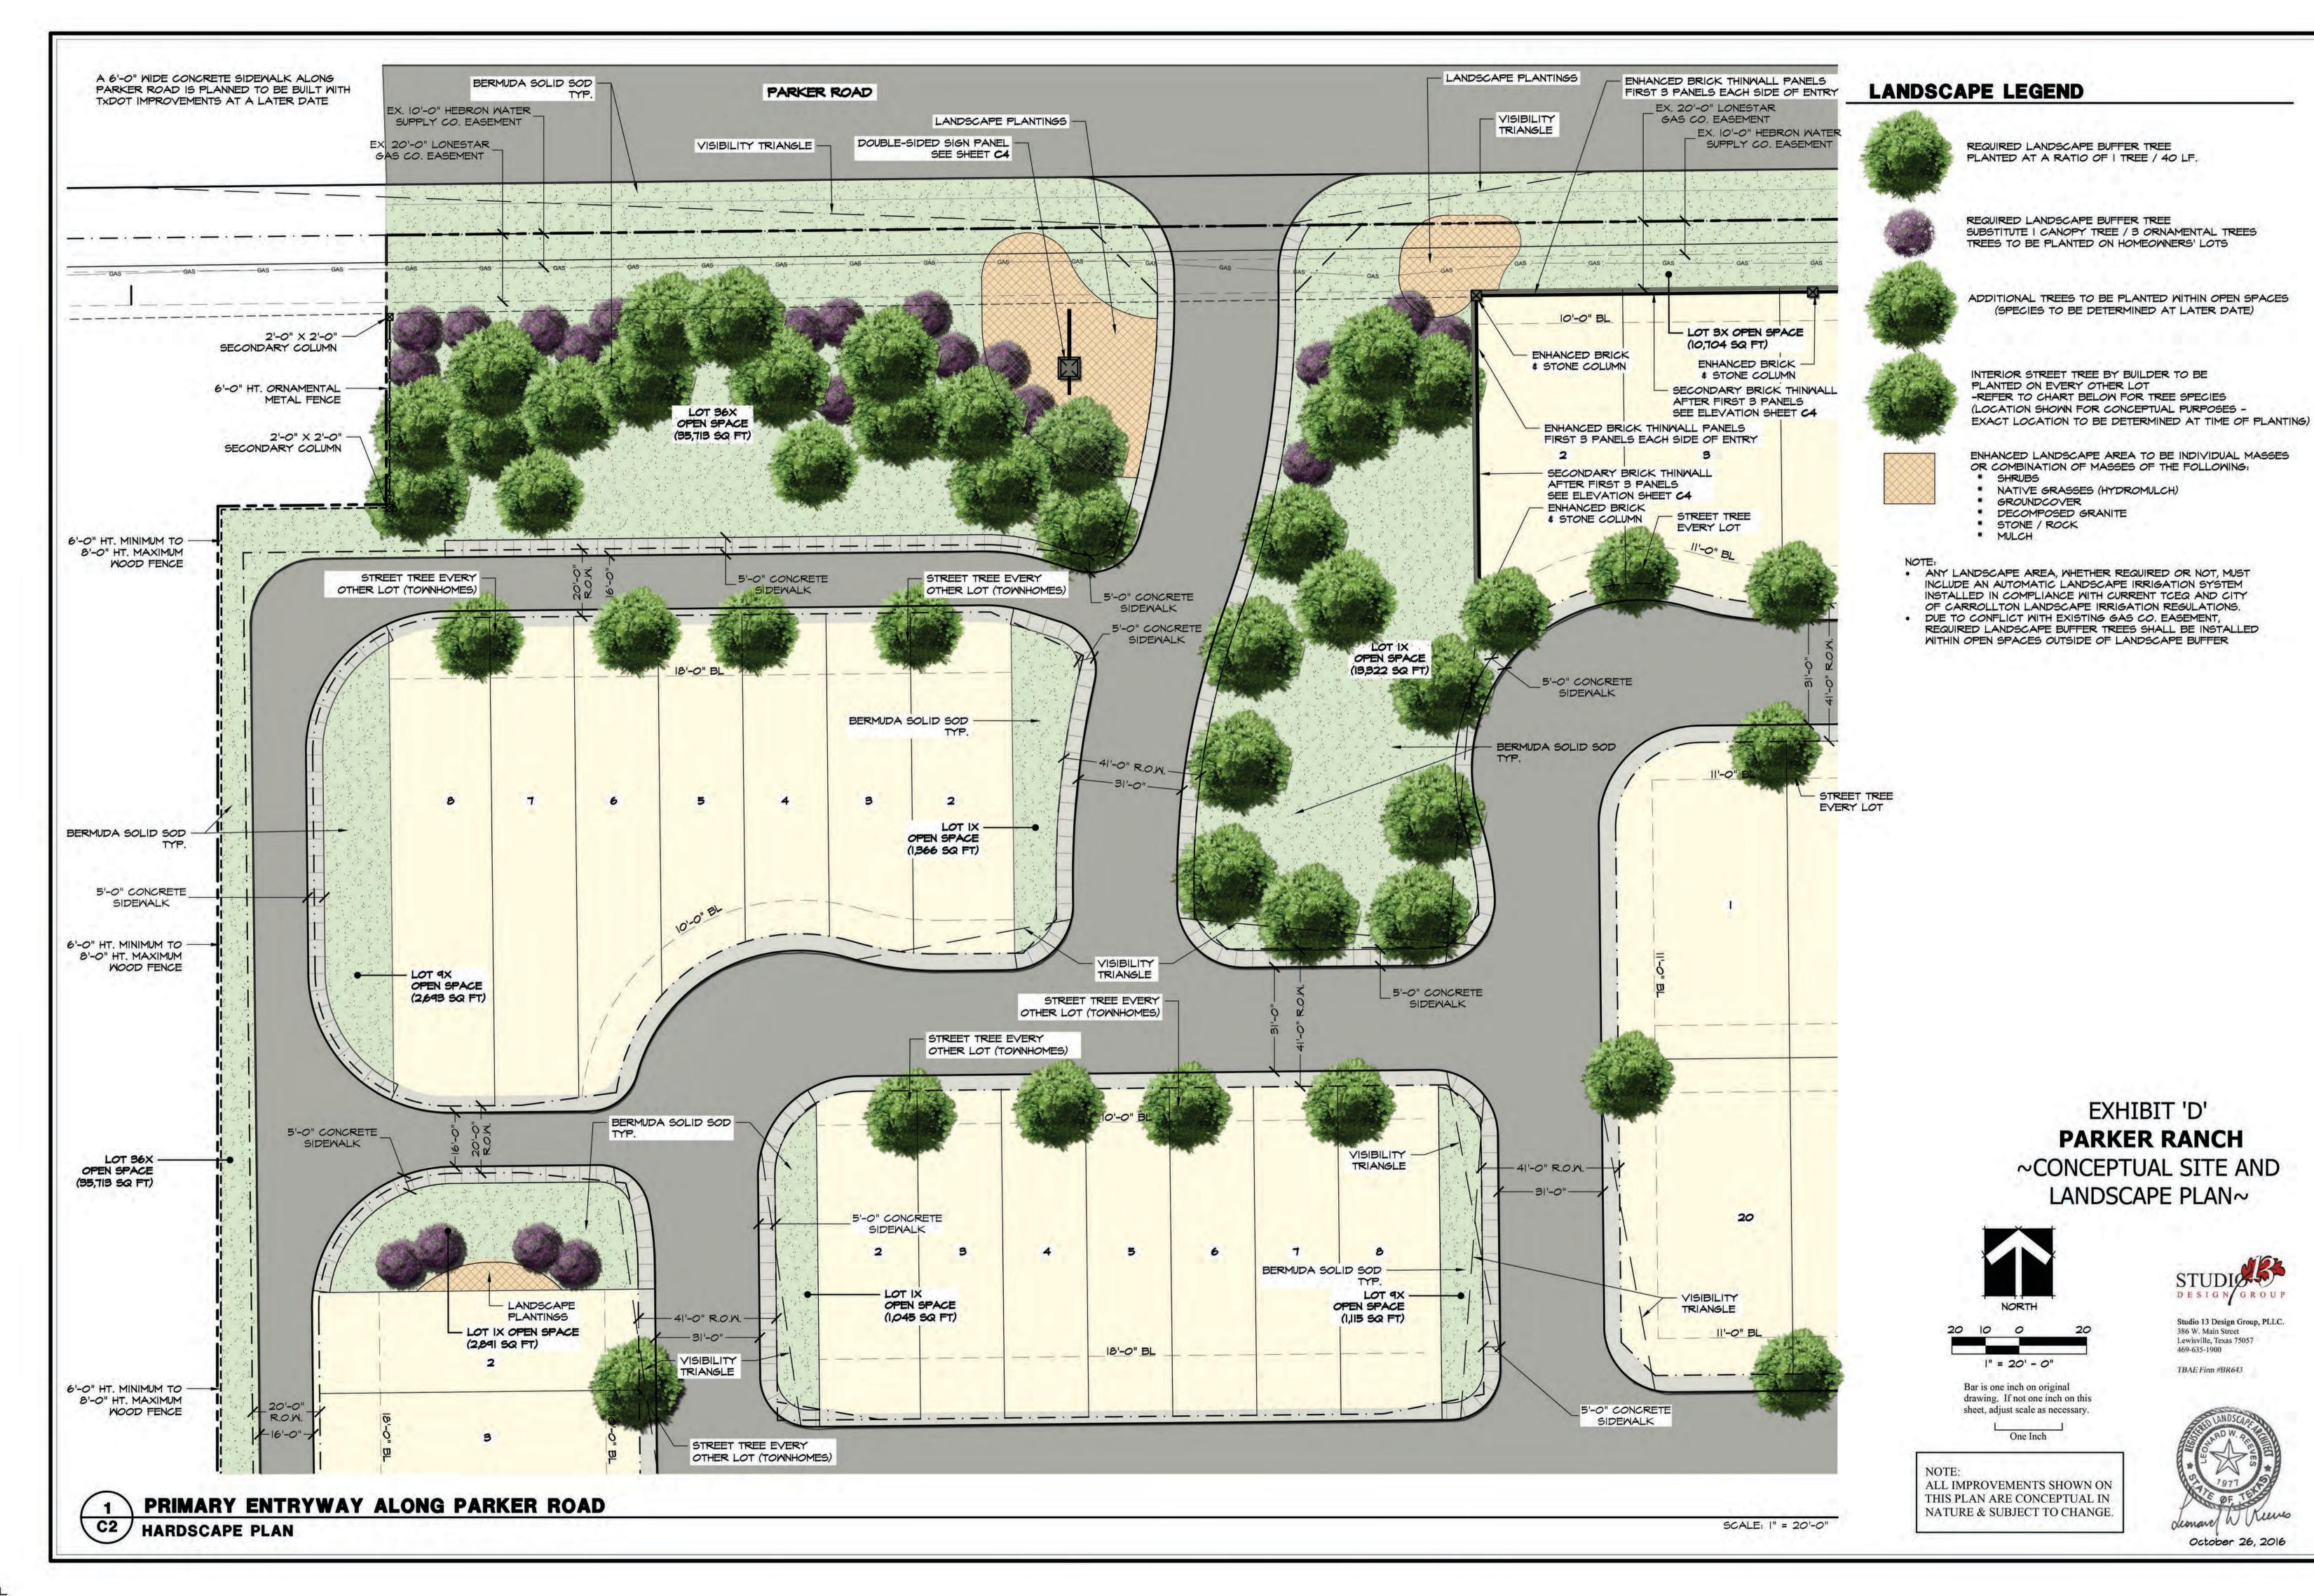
EXHIBIT 'D' PARKER RANCH ~CONCEPTUAL SITE AND LANDSCAPE PLAN~
